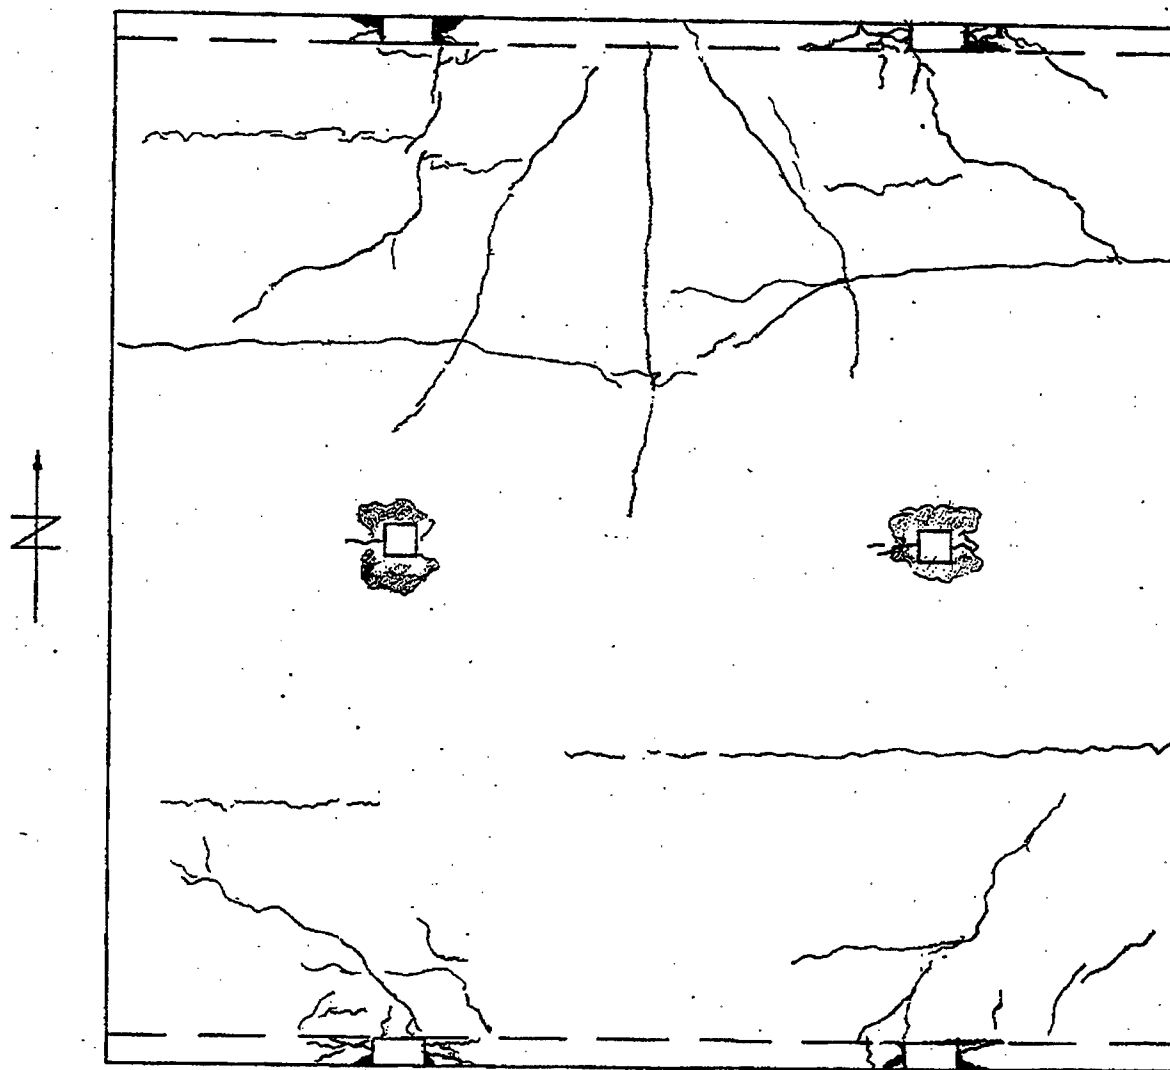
Crack Pattern, Third Floor Slab, Bottom Side, Post-E200N
